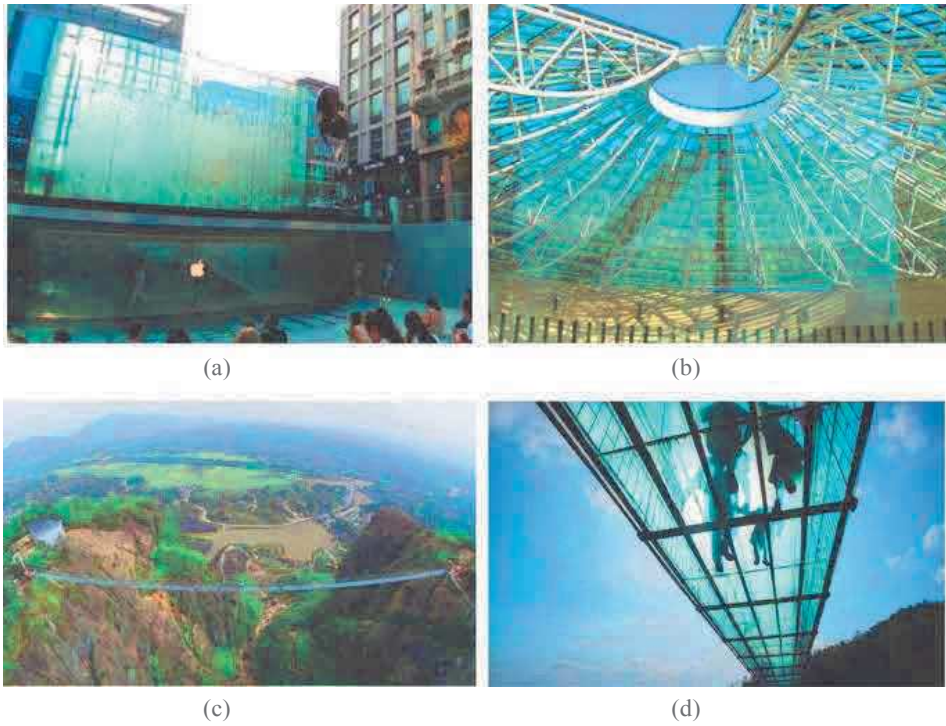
Examples of structural glass in (a) facades, (b) roofs, (c) and (d) footbridges ([www.telegraph.co.uk](http://www.telegraph.co.uk))
